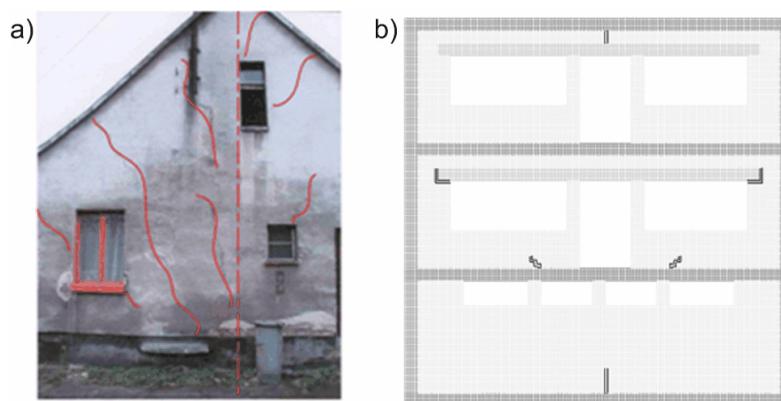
Typical damage of the building caused by a convex basin (NW): a) real building, b) numerical model
